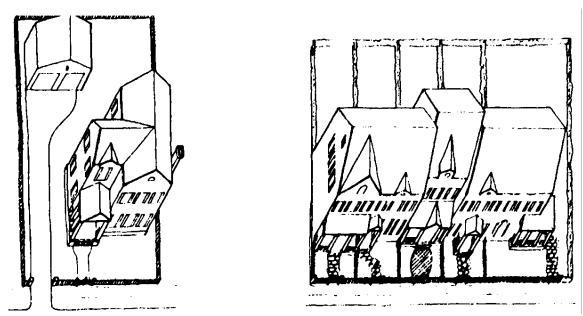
All dwelling units shall have a private yard, patio or upper-floor terrace.
